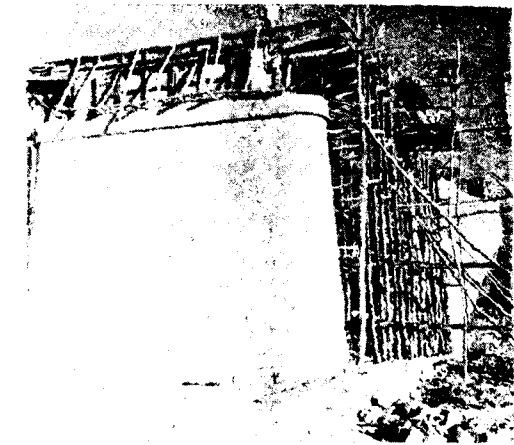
Scaffolding and formwork for the deck on Madras side end view
